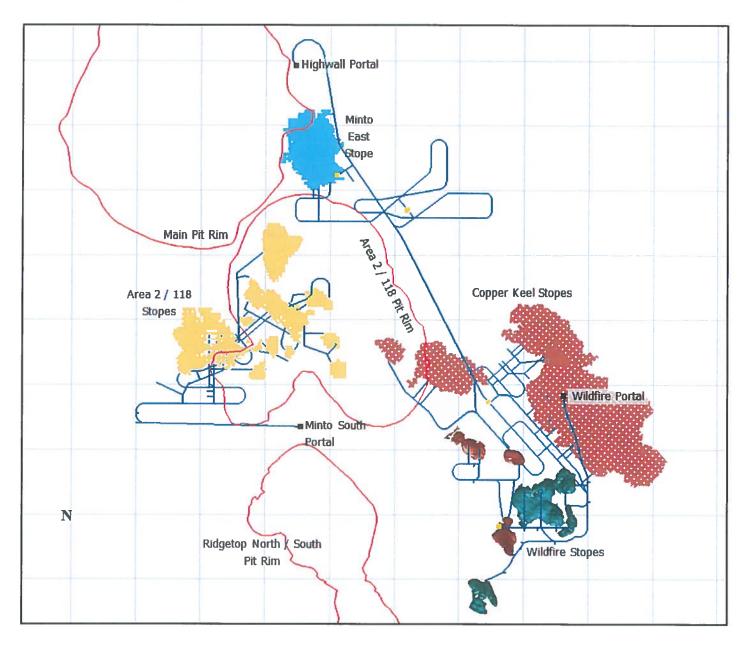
Mine access plan view showing location relative to surface mining areas
